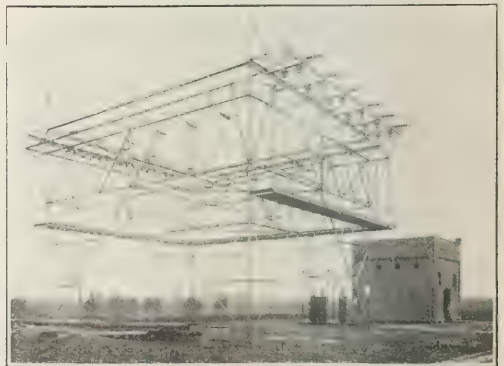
SWITCHING TOWER AND HAMPTON SUBSTATION
